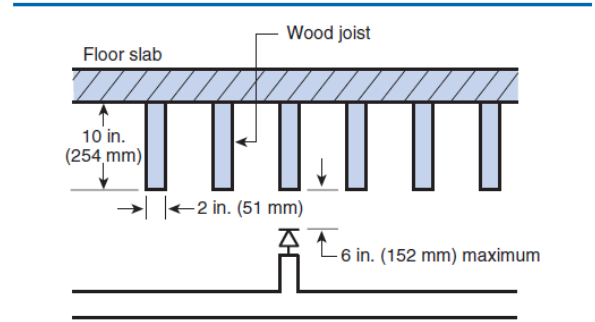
Placement of Standard Spray Upright Sprinklers Underneath Solid Wood Joist Construction.
